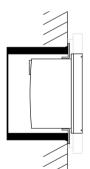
Sectional drawing. The Sensor KNX TH-UP Touch fits into a standard socket (Ø 60 mm, depth 42 mm).
